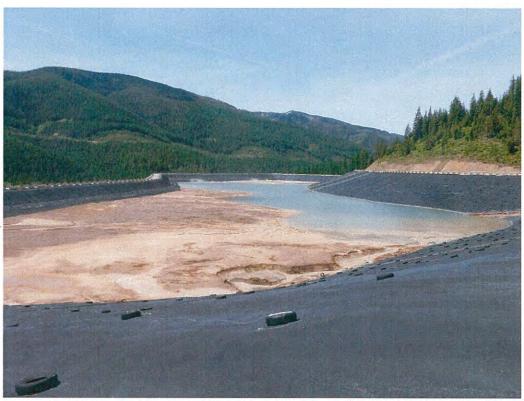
/ P1050021 – Southwesterly view of tailings pond 4
